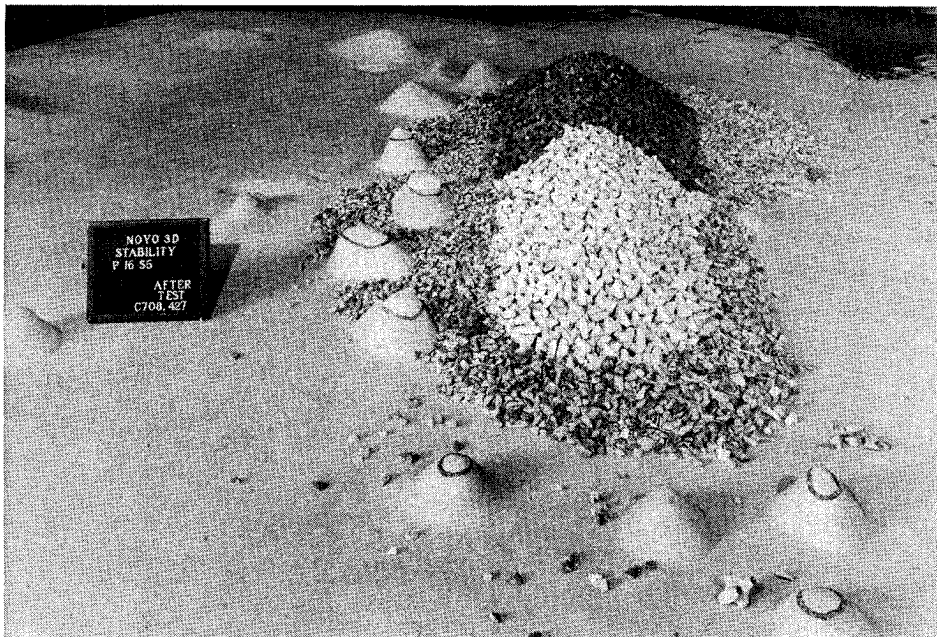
Plan 16, south roundhead after five series of modified Storm IB waves
